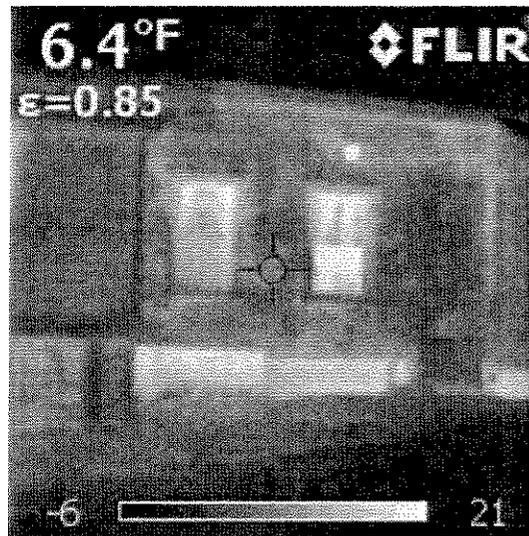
Grant House: Heat leakage at windows and foundation walls
